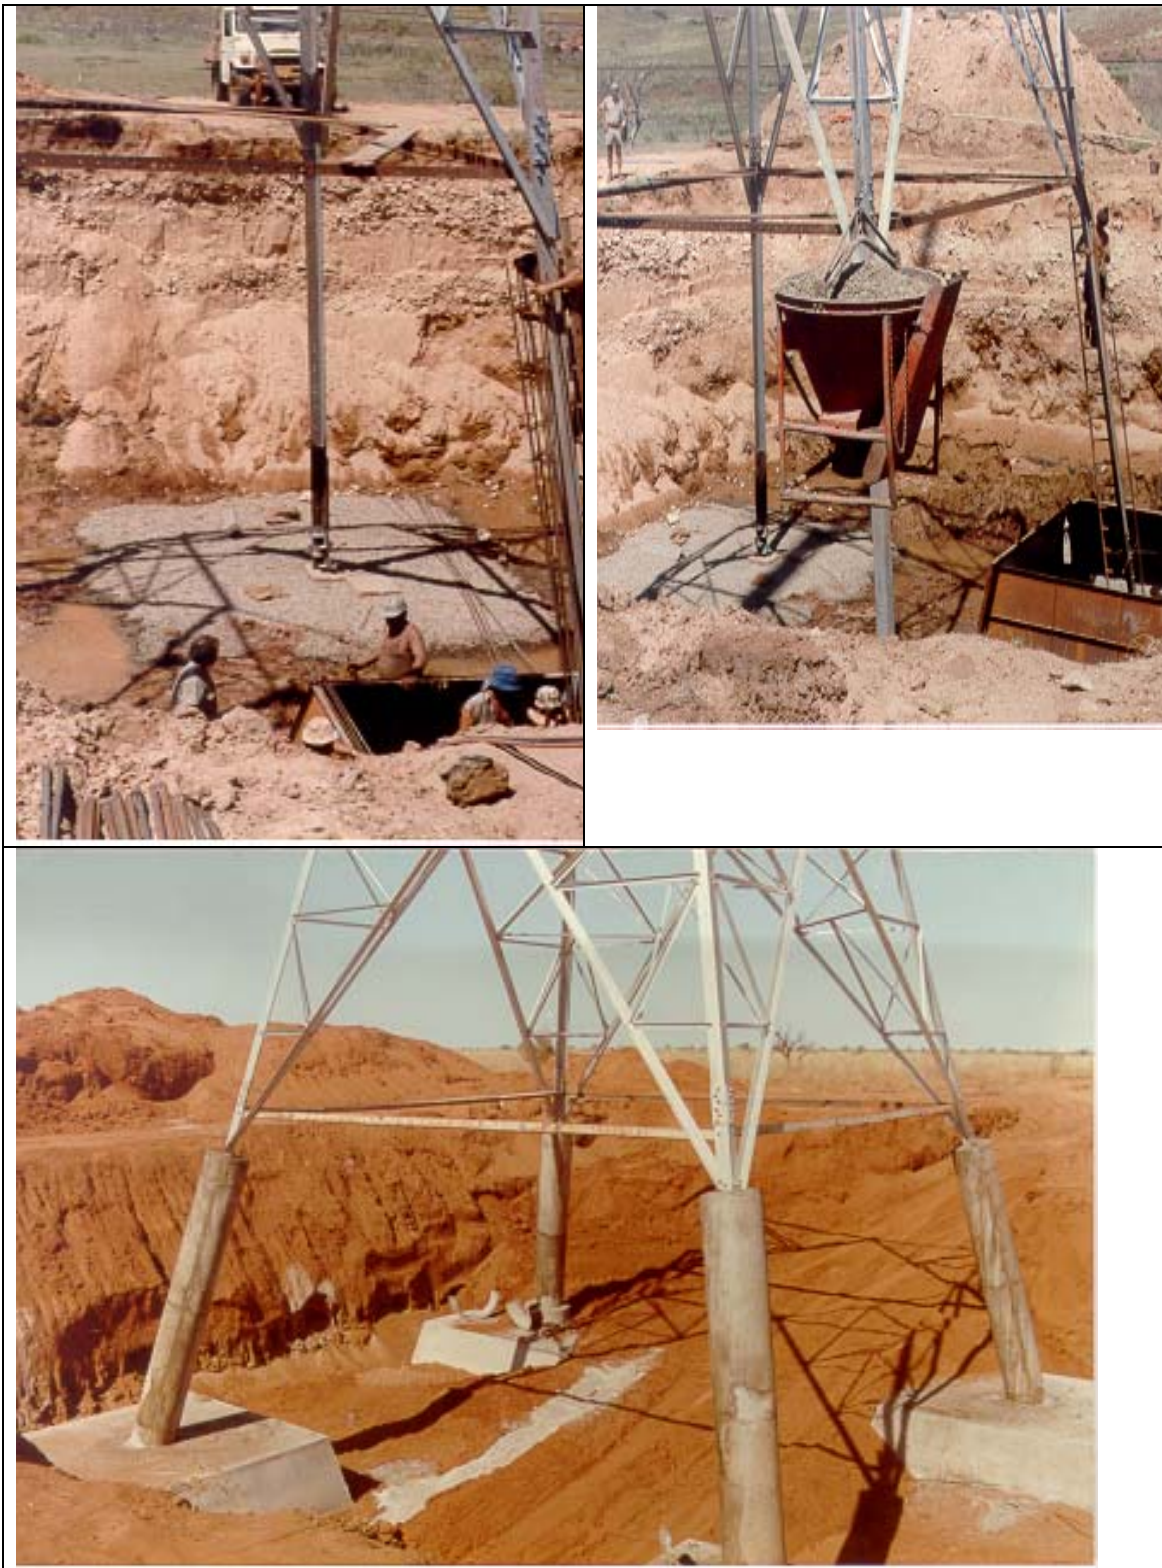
A.11c – Bored pile 2 x 1.2 m diameter per leg, details of pile cap and chimney extension 110 kV lattice steel towers ~ Germany
